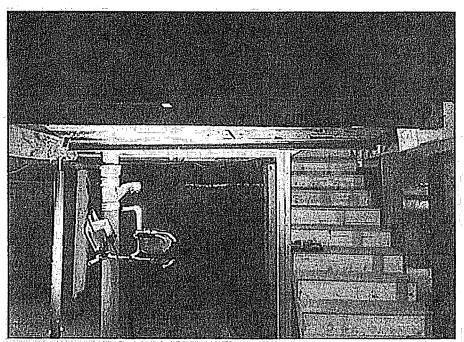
Steel W-beam possibly shoring existing support beam; shoring unstable as installed.
